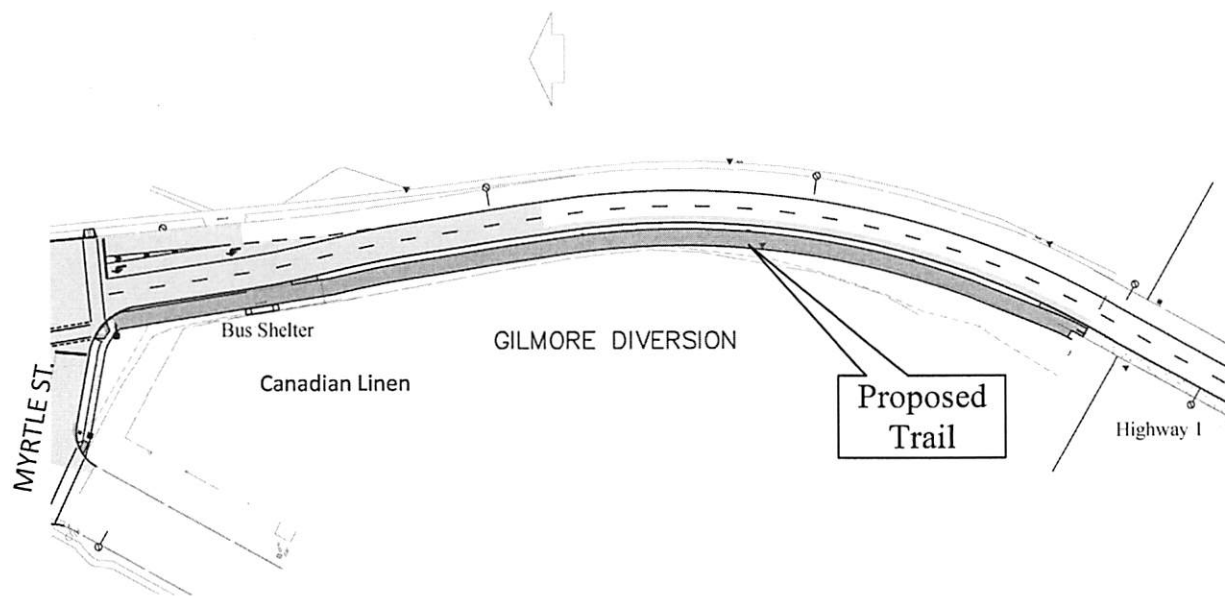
Proposed Urban Trail alignment on the west side of the Gilmore Diversion from the Gilmore Overpass to Myrtle Street.
